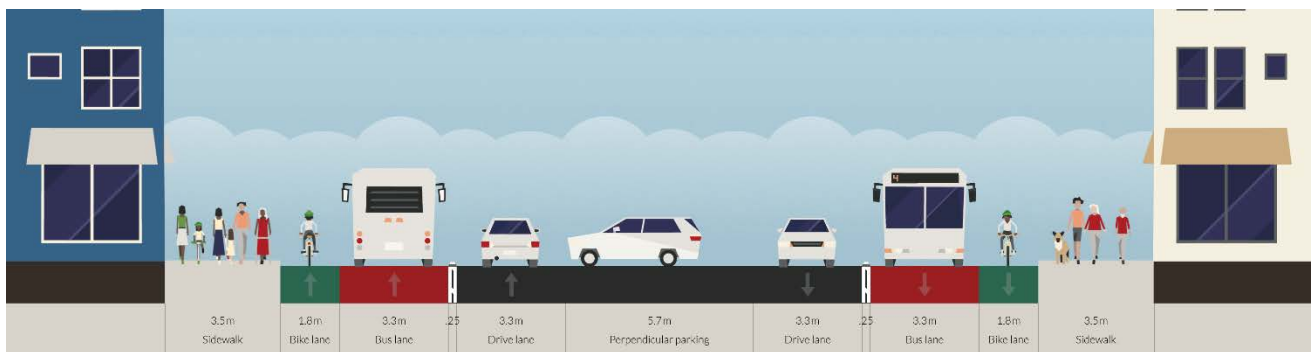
Potential reconfiguration of Lonsdale Street and Queen Street
